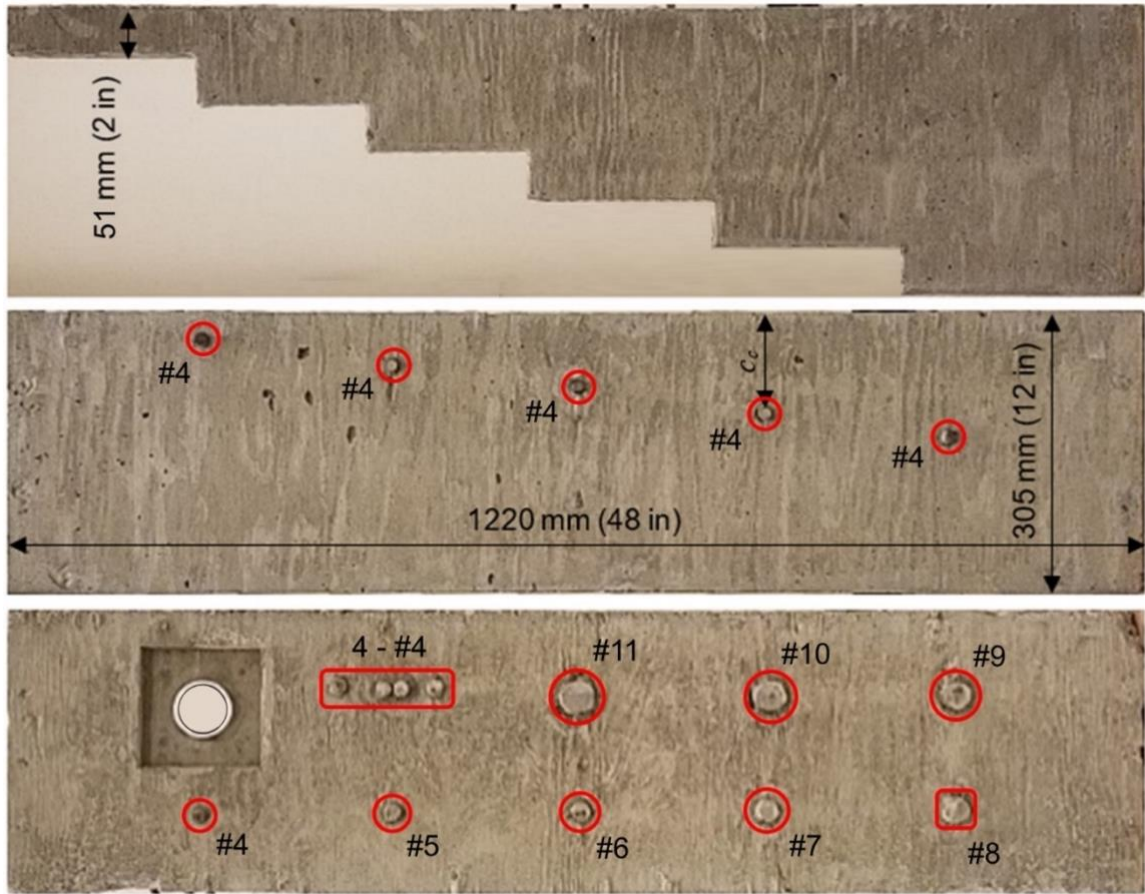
Photos (rectified elevations views) of three reference specimens (top to bottom): Specimens 1, 2, and 3. Rebars are highlighted with red circles/rectangles.
